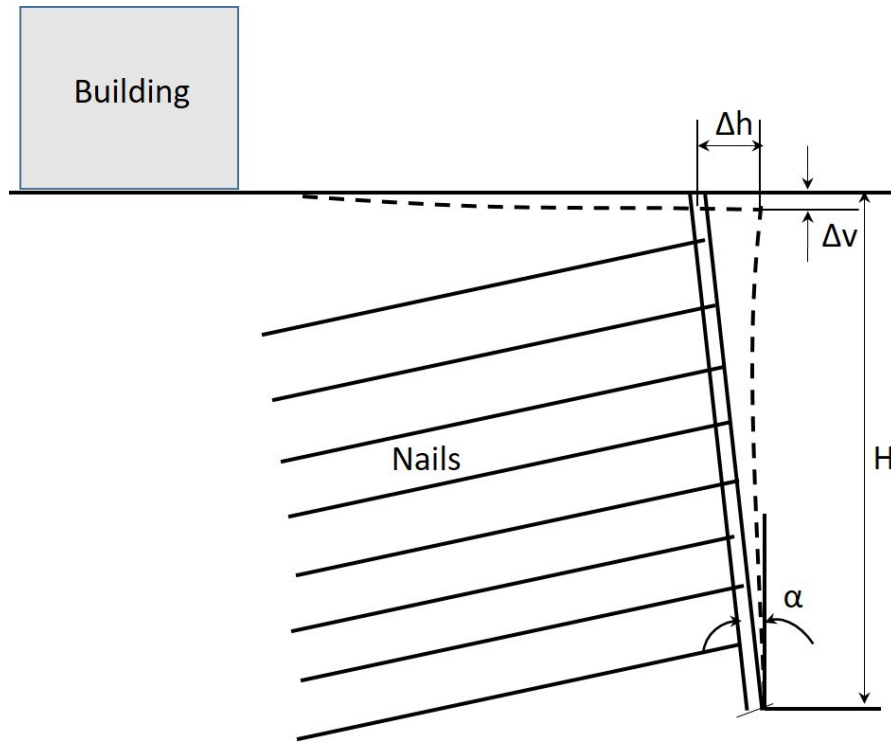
Deformation of the Soil Nail Wall (modified after Byrne et al. [15]).
